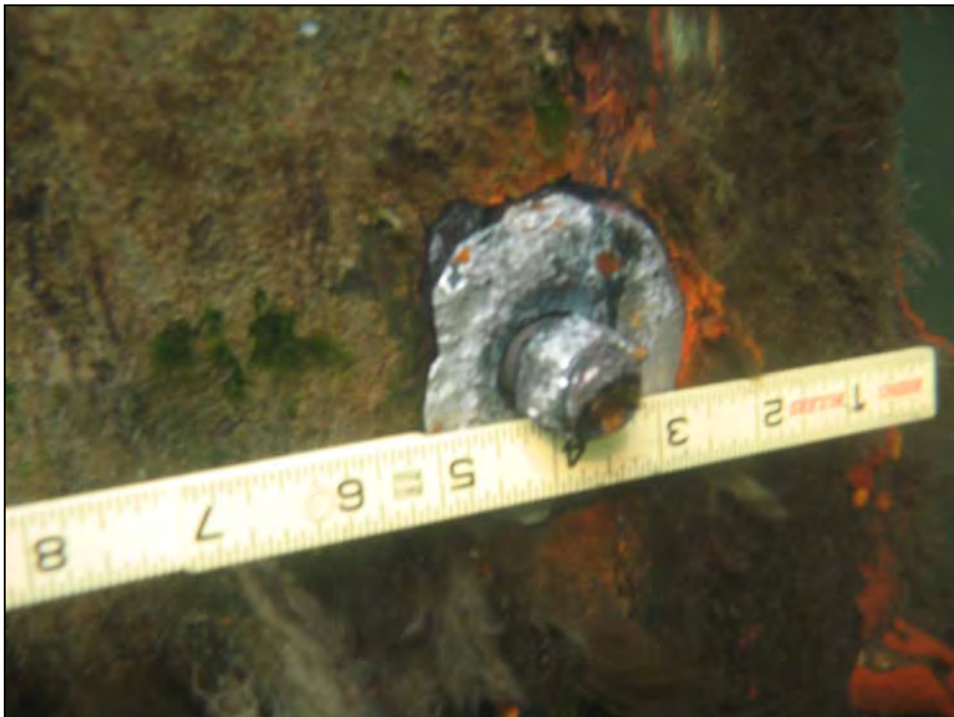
Typical low water connection hardware. (Photo by Childs Engineering Corp.)
